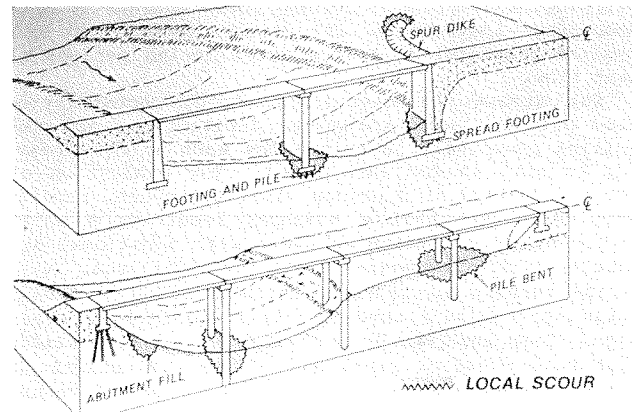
Diagram of local scour at bridge piers and abutments.
